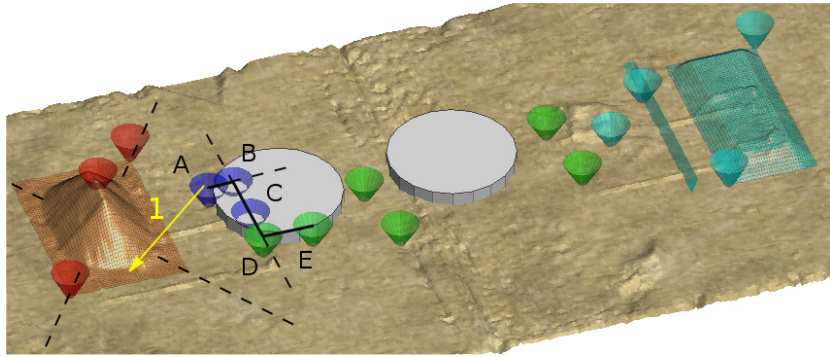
Simulation of pile transfer job with one loader and two dump trucks.
